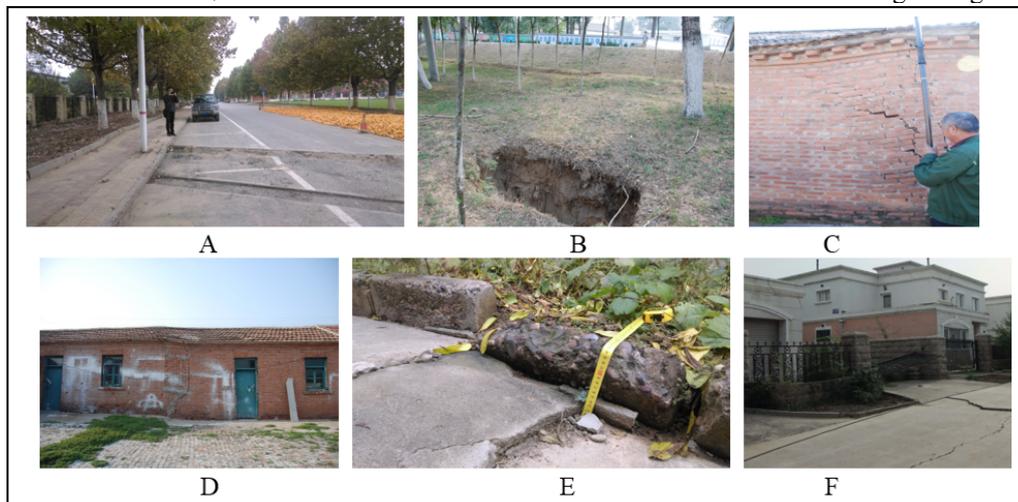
Typical pictures of damages caused by Gaoliying ground fissure.
